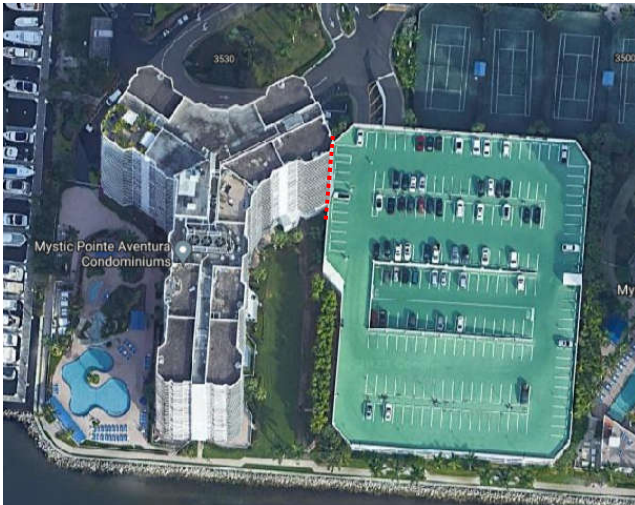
Existing expansion joint course between building and garage (Aerial view)
